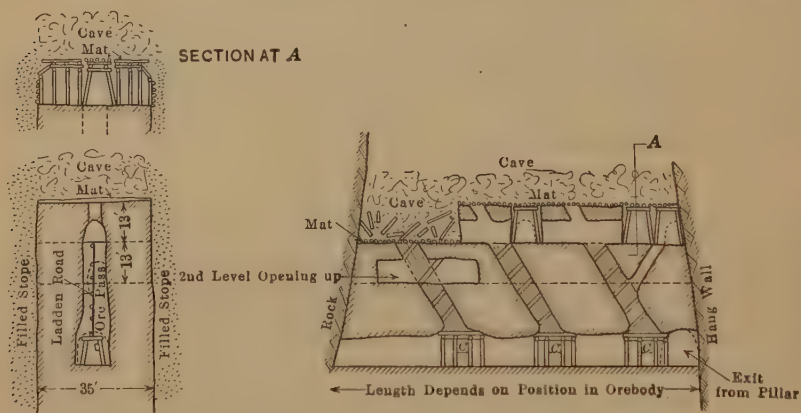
FIRST METHOD OF PILLAR MINING—CAVING.
